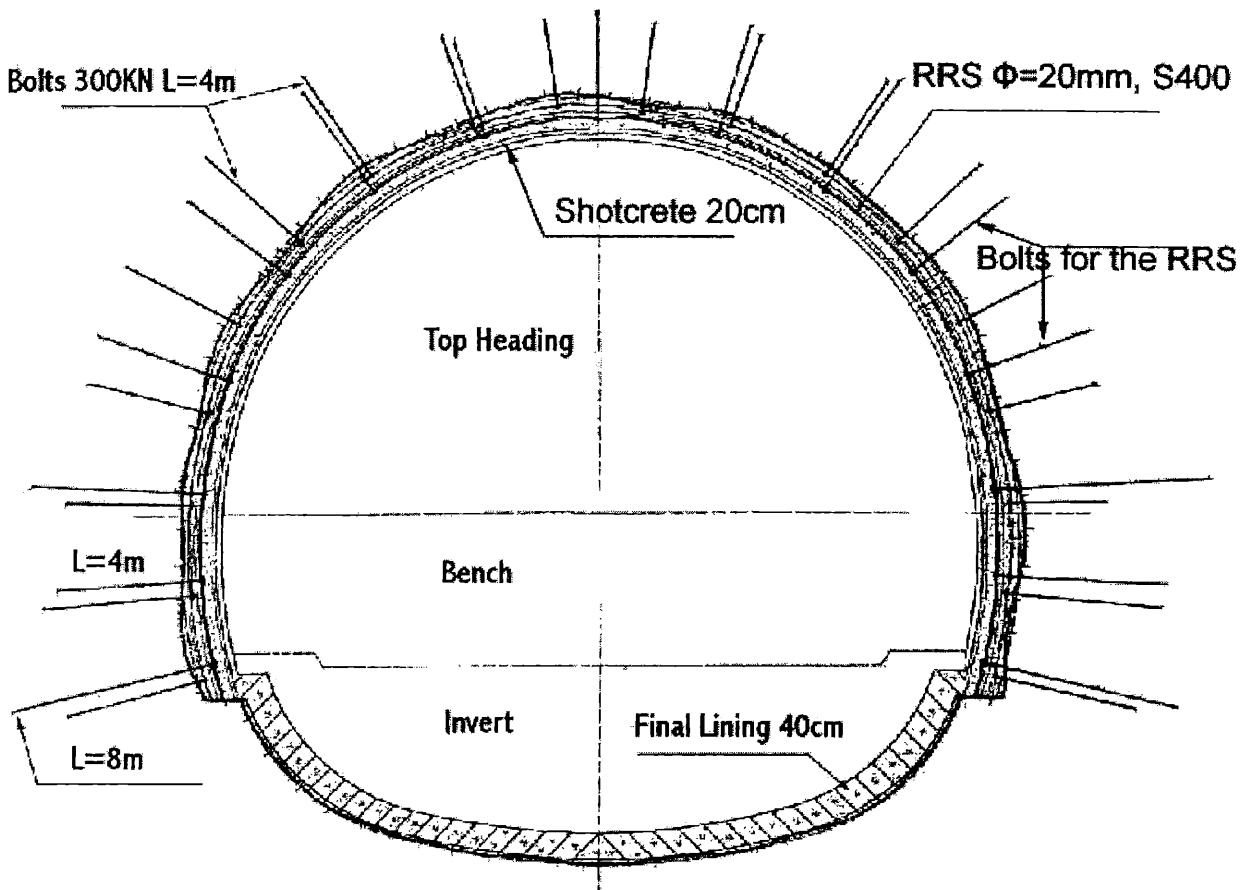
Excavation and primary support measures of the Mpozaitika tunnel; cross section.
